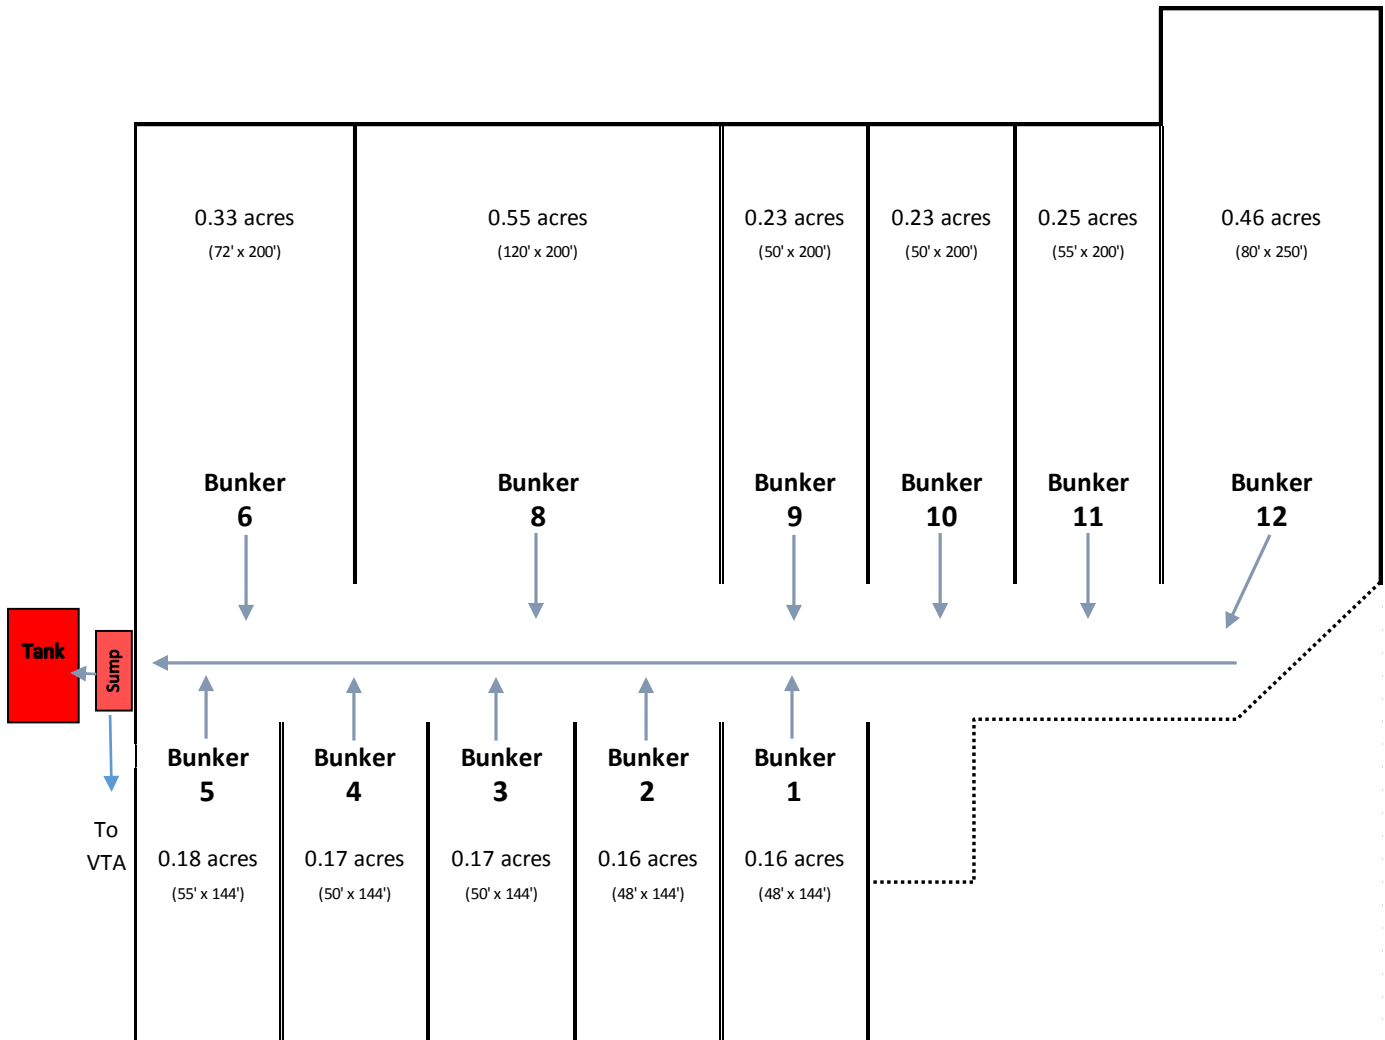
Feed storage bunker and leachate collection system layout for Farm A.
